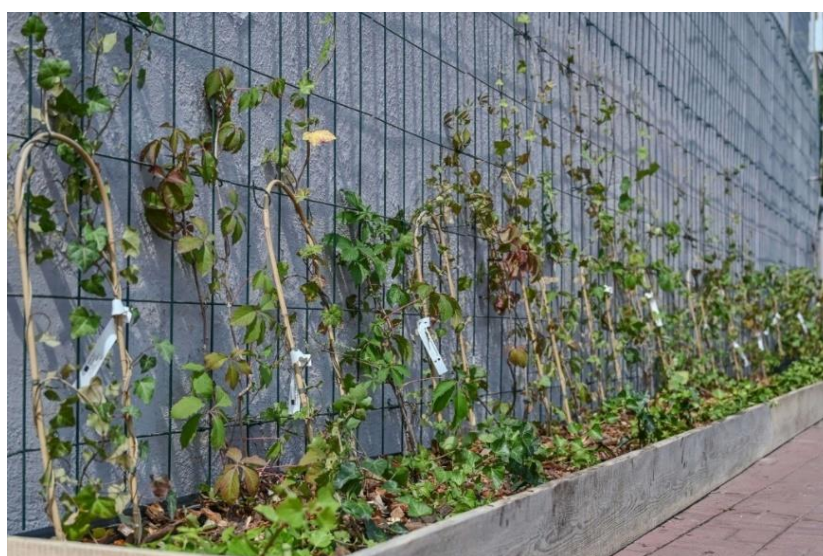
Green façade created on the external wall of the City Hall building in Częstochowa [26]
